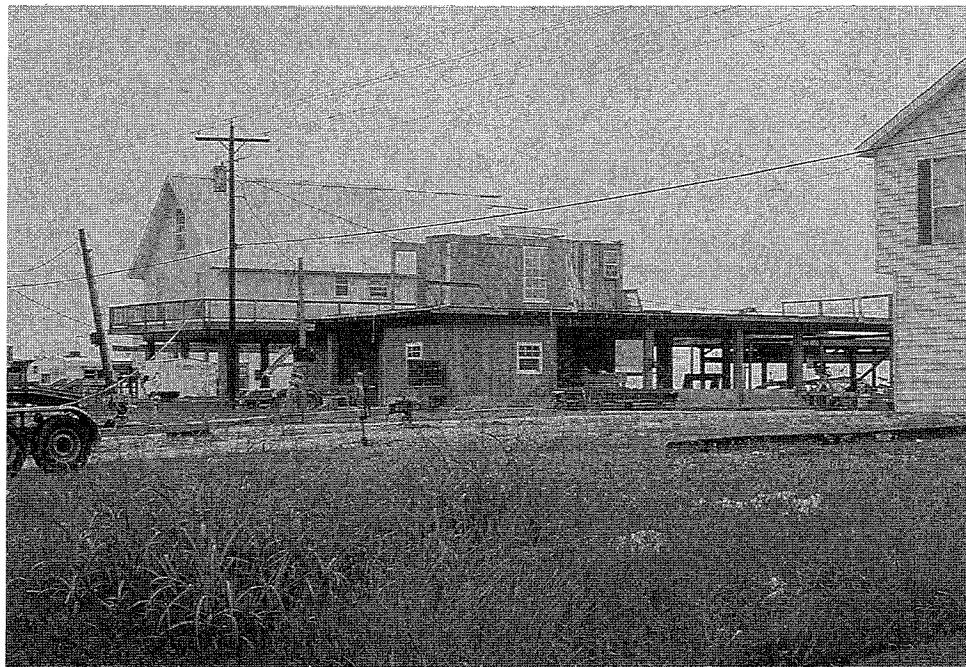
Destroyed coastal home on a concrete pier and heavy timber foundation.
